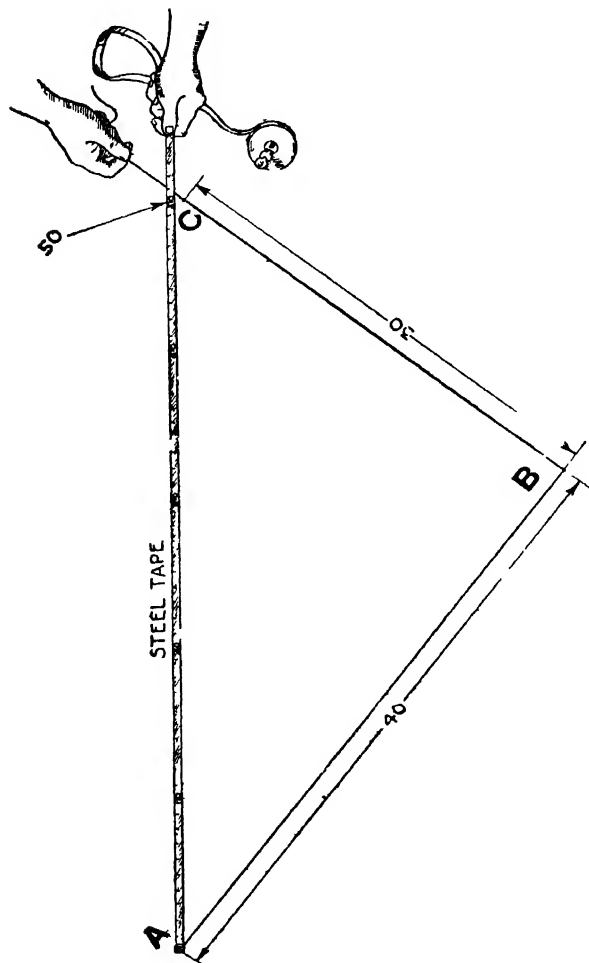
Method of laying out lines for a rectangular building by aid of a 3-4-5 triangle. This is virtually the process of constructing a large layout square using lines and steel tape in place of boards.
